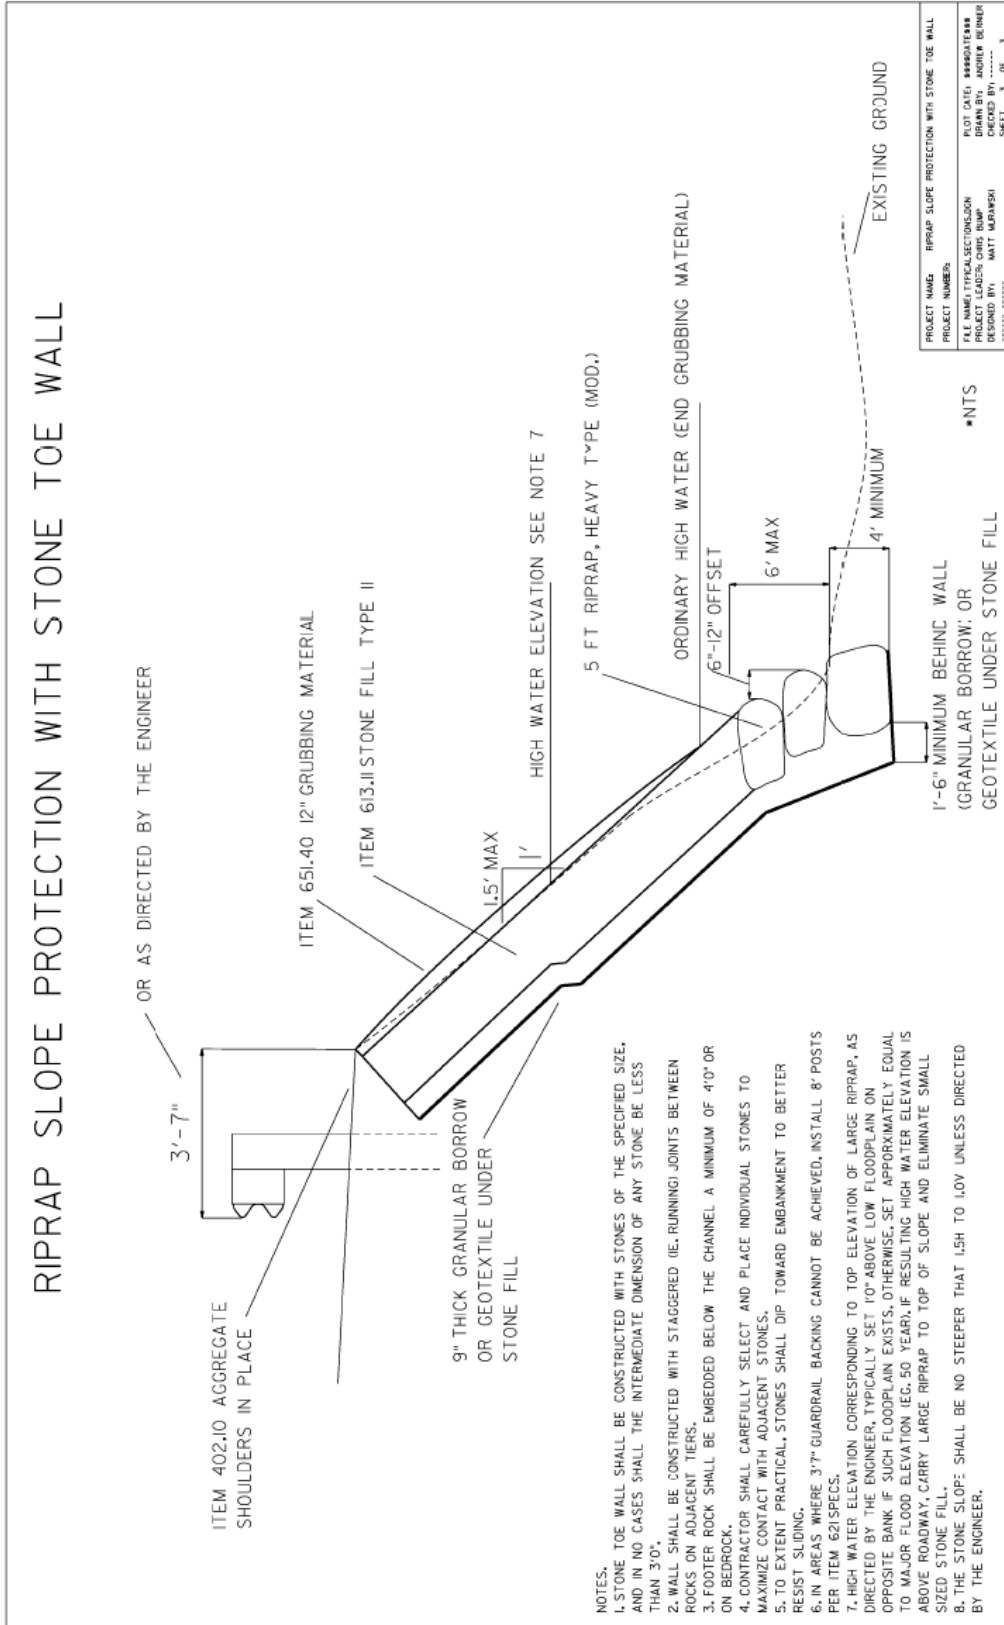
Placed riprap wall typical detail. (Source: Dubois & King, VTrans, Fitzgerald Environmental Associates, Milone & MacBroom, Inc., 8/30/2012)
